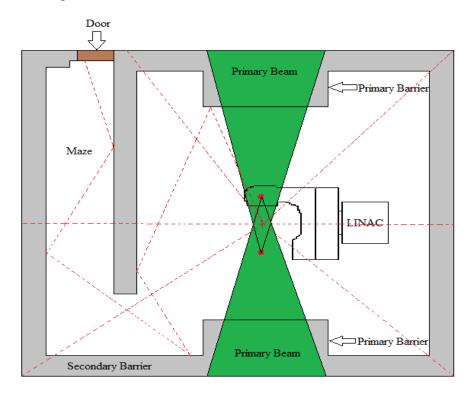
A Plan view showing the directions of primary beam and secondary beam, primary and secondary barrier, maze, and door [16].
